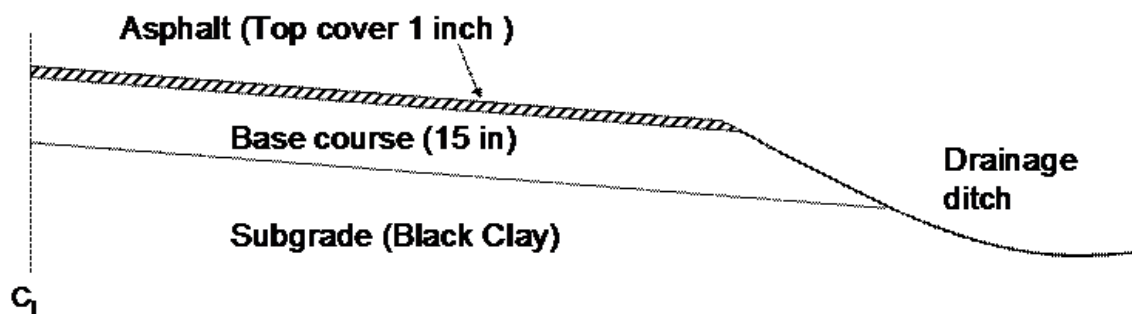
Cross section of the FM 2 pavement before reconstruction
